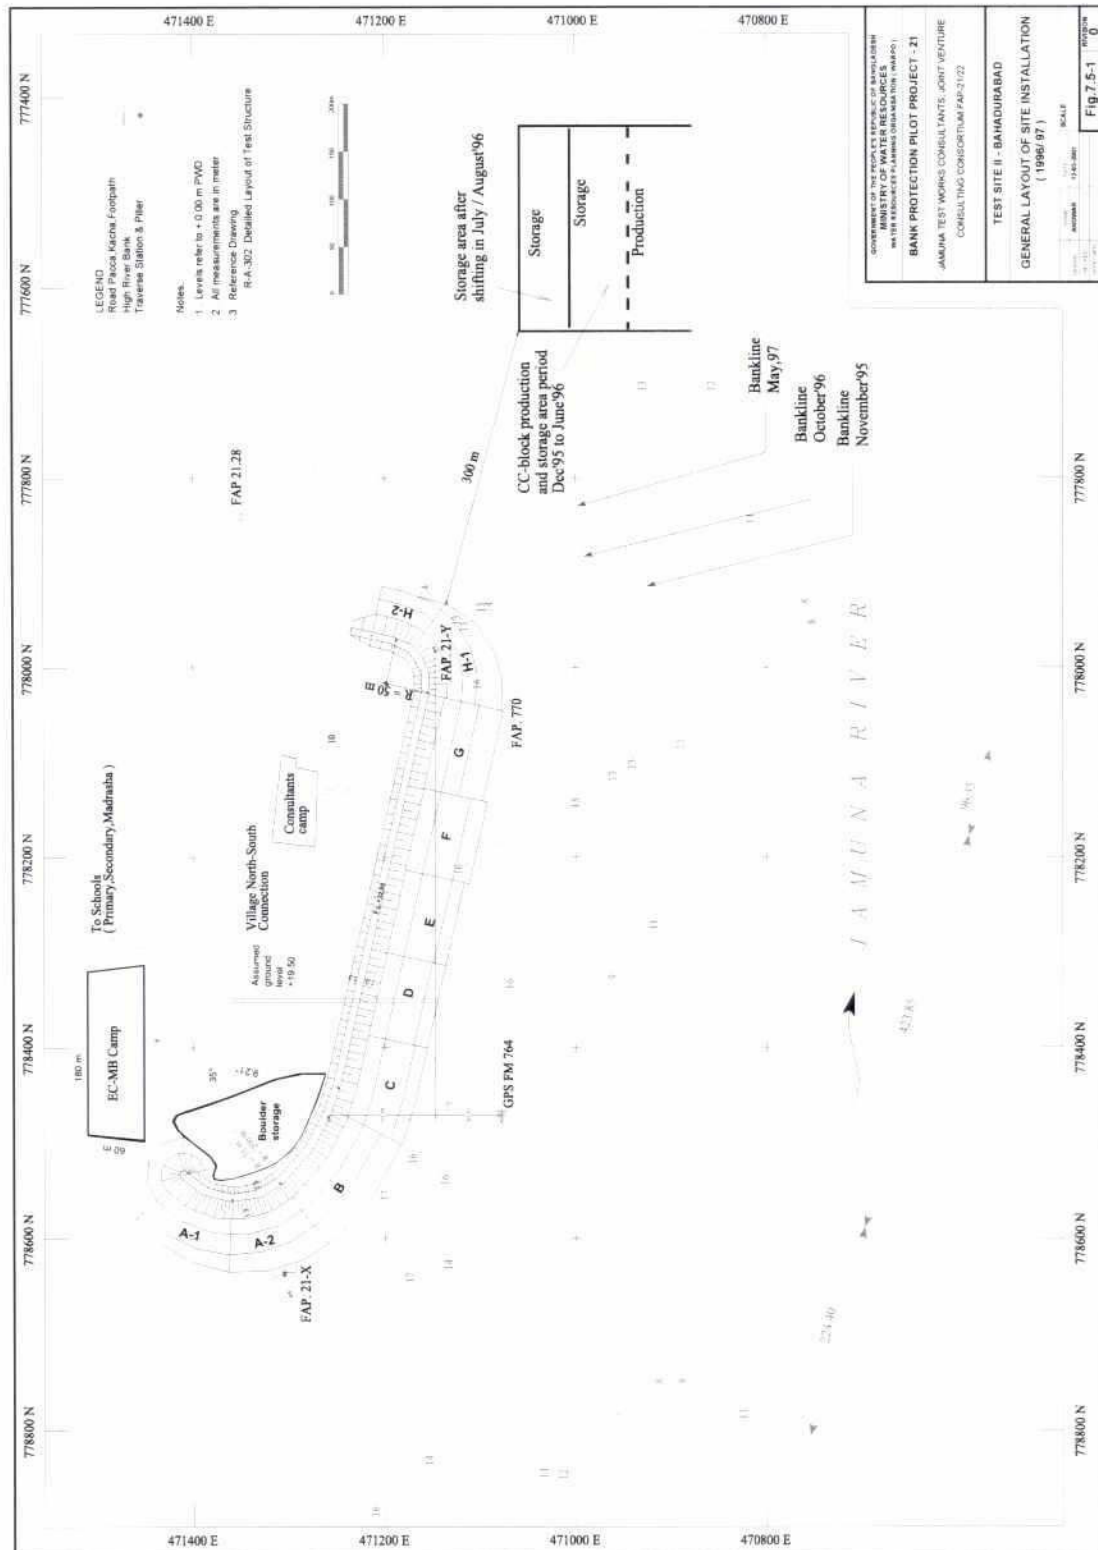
General Layout of Site Installation at Bahadurabad
